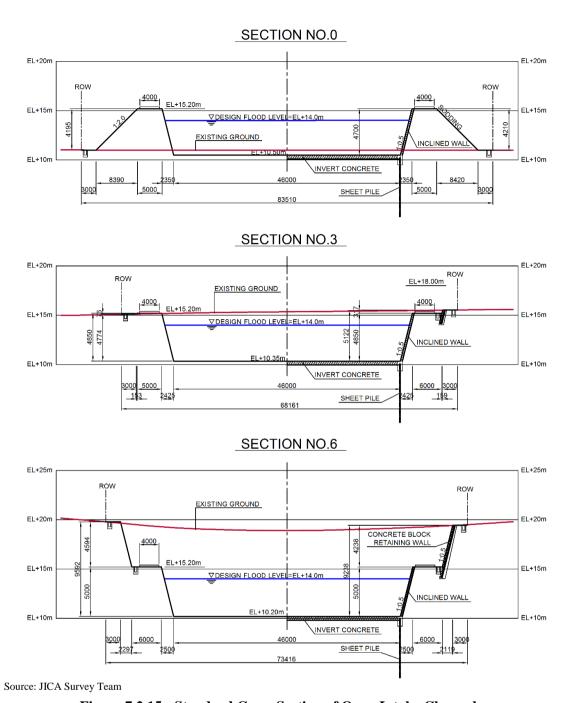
Standard Cross Section of Open Intake Channel
